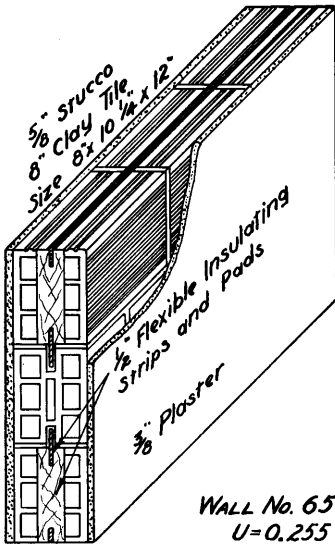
SECTIONAL VIEWS OF TEST WALLS
